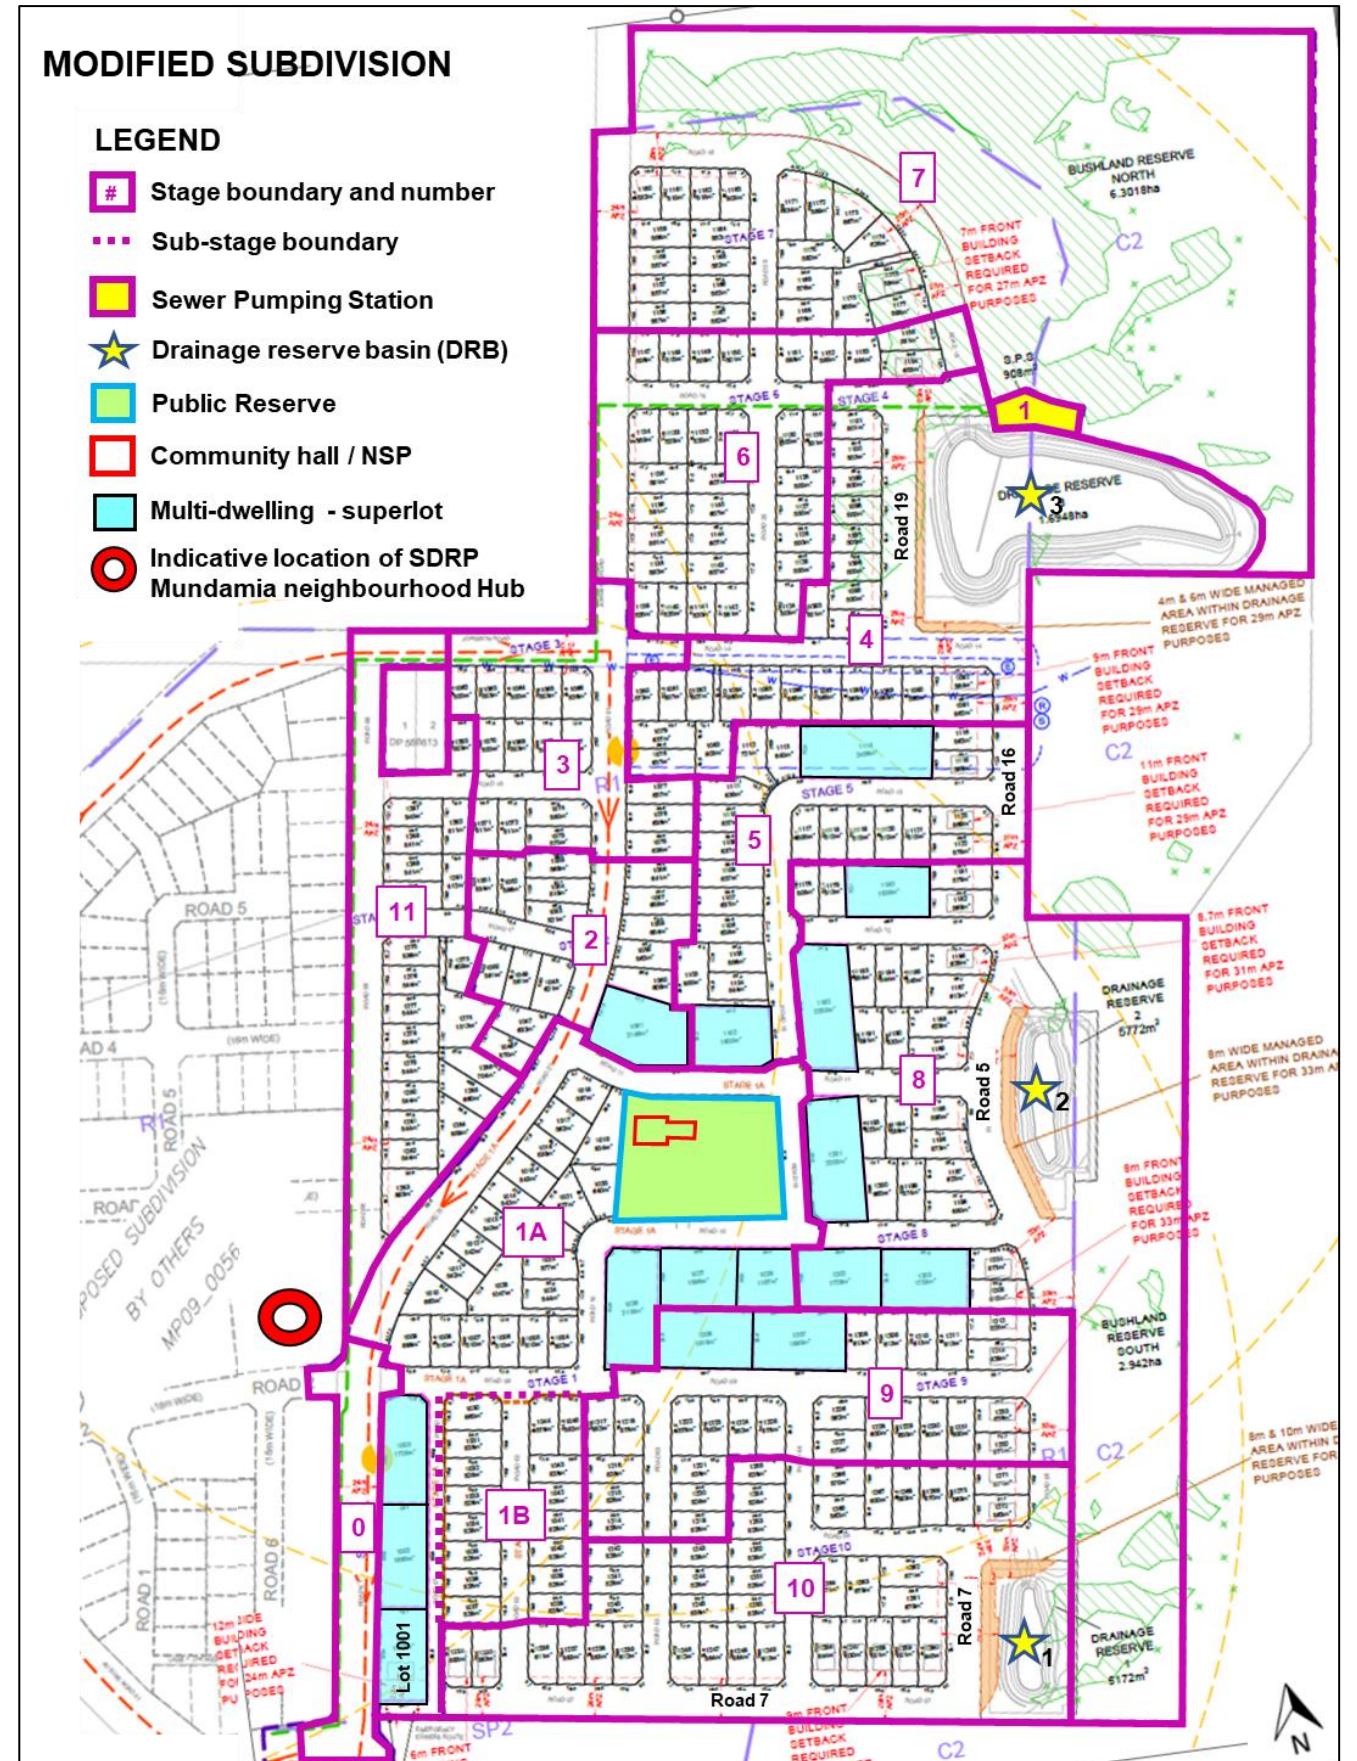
| Proposed modified subdivision layout (Base source: Applicant's EIS)
